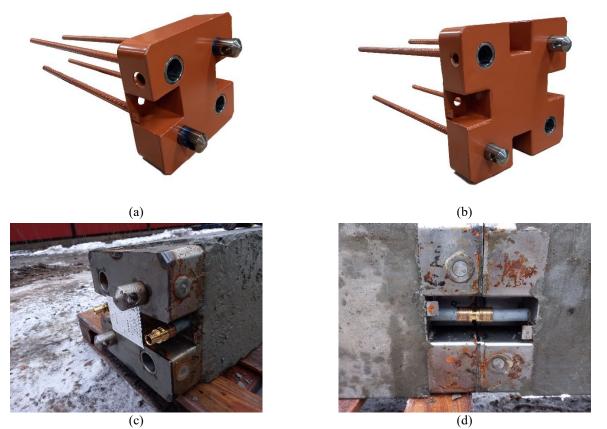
Driven energy pile (DEP) Joint, (a) 270 mm with a single loop, (b) 350 mm with two loops, (c) 270 mm segment with a single loop before connection, (d) two segments connected structurally and hydraulically.
